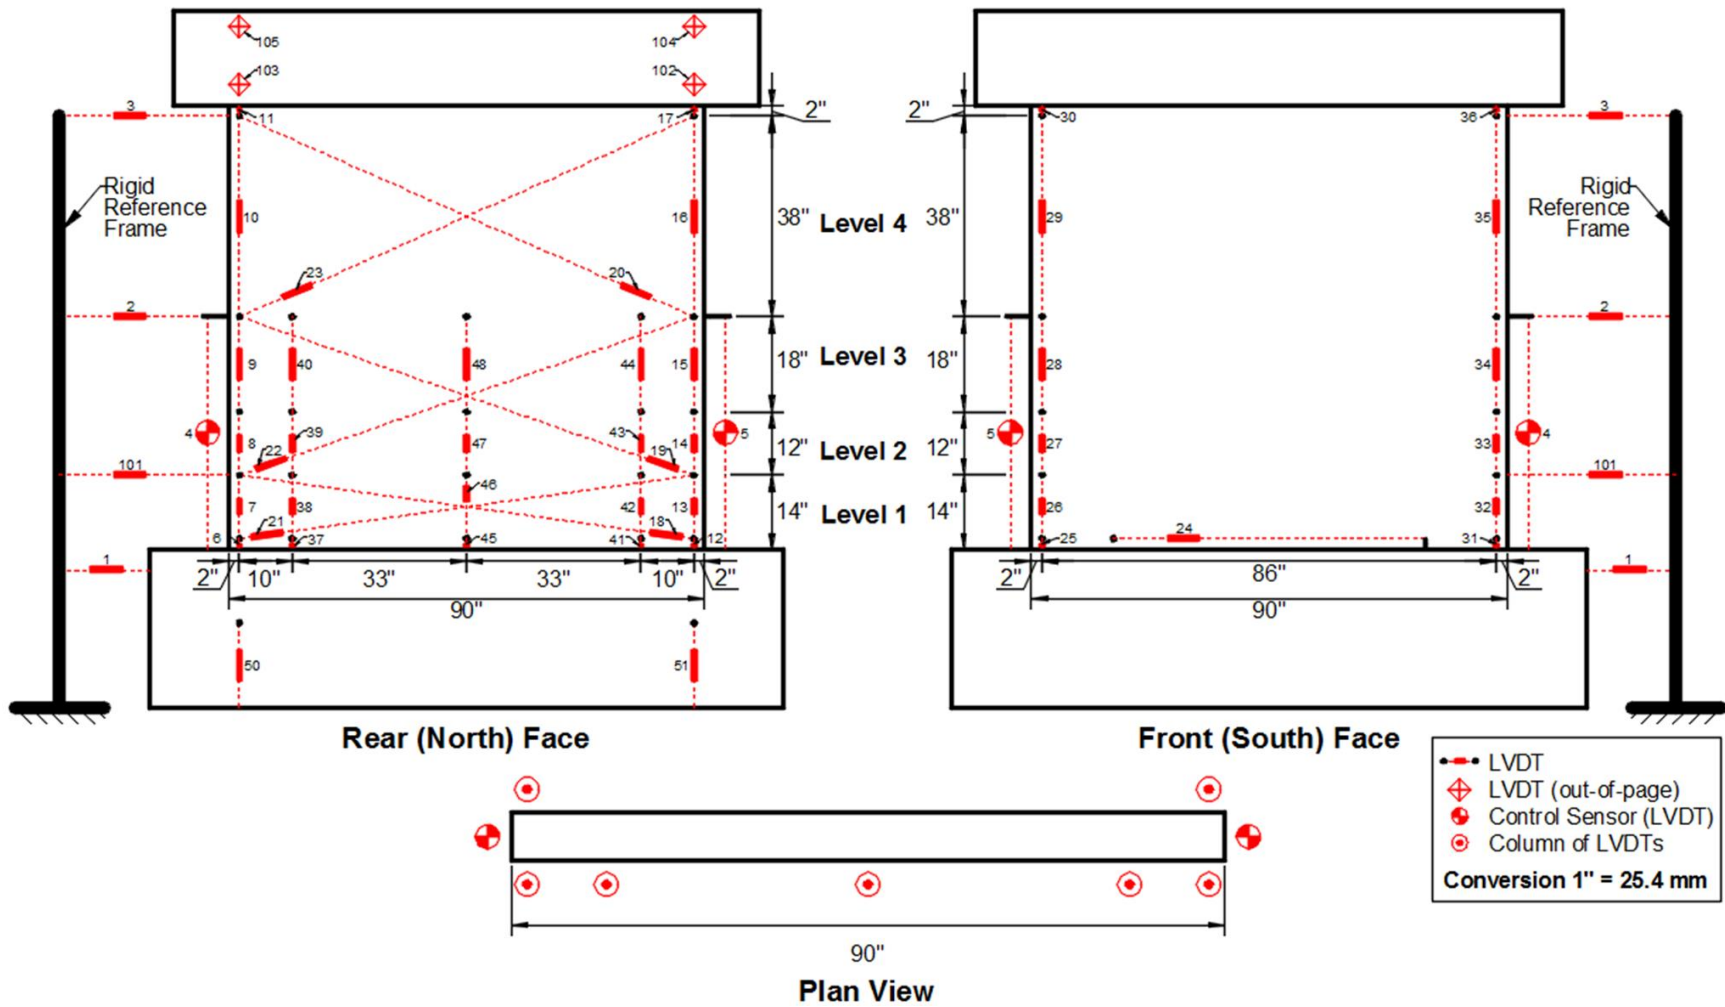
LVDT layout for specimens WP5, WP6, and WP7
